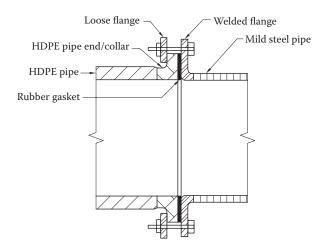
Typical steel–HDPE pipe coupling.
